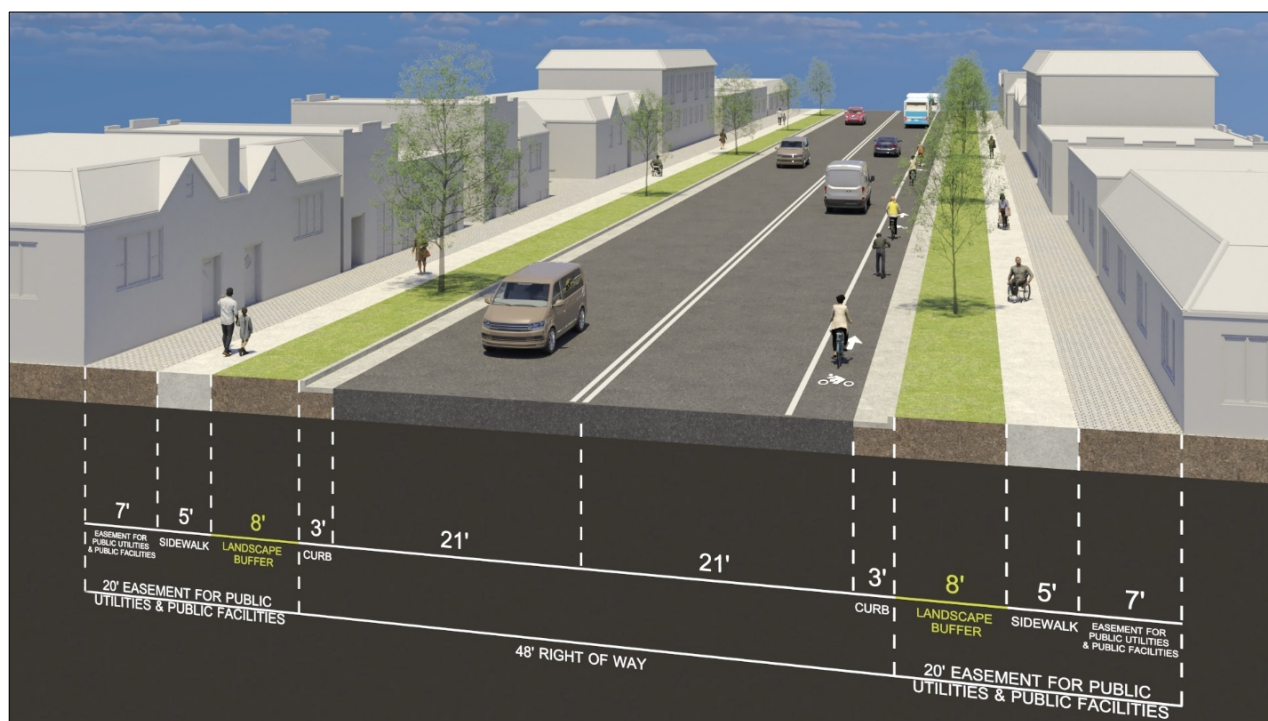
Re-Imagine North Watt Corridor Plan, Typical Watt Avenue Cross-Section
